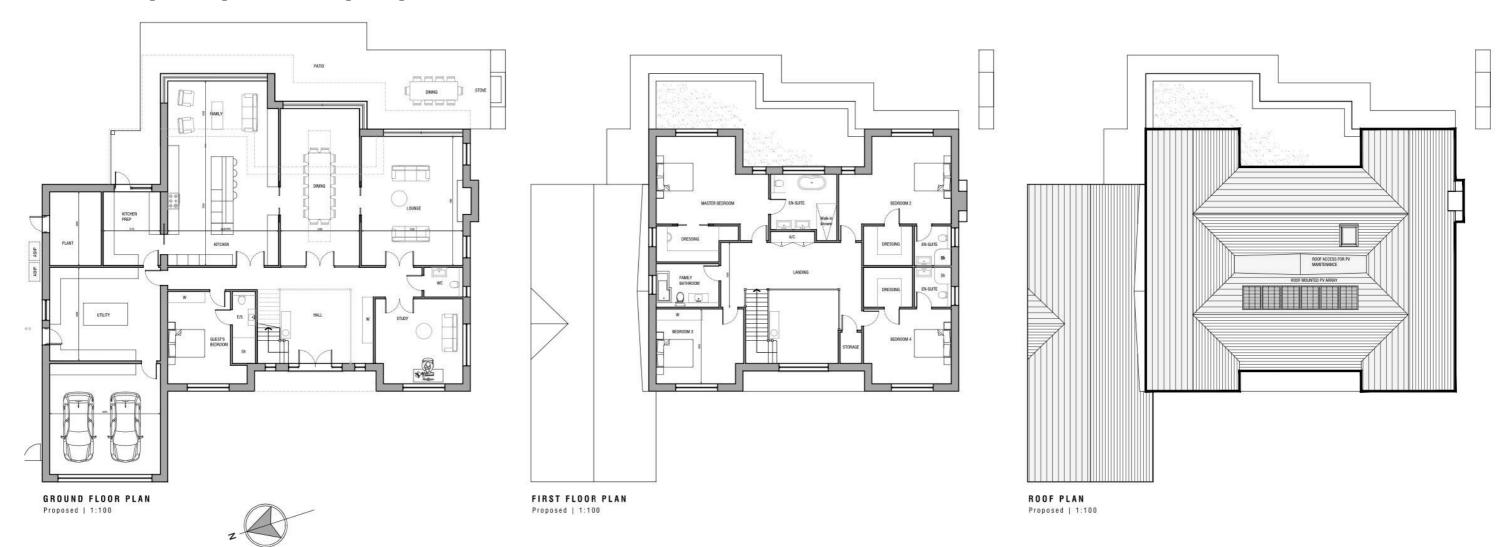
DRAWING 2410 301 Proposed Plans Plot 1 (Extract)
